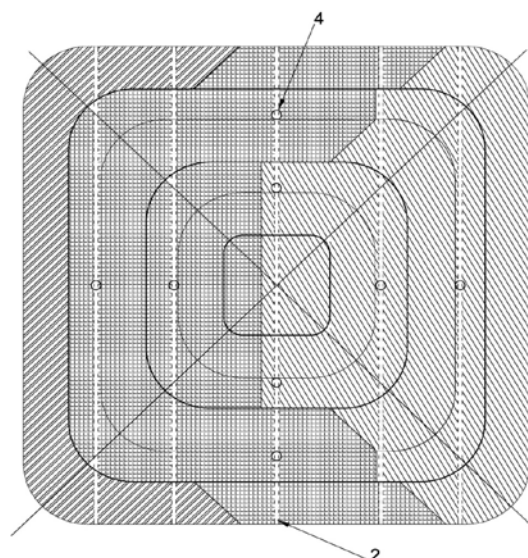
Technogenic deposit plan in the filled form: 2- horizontal workings; 4. – vertical workings.
